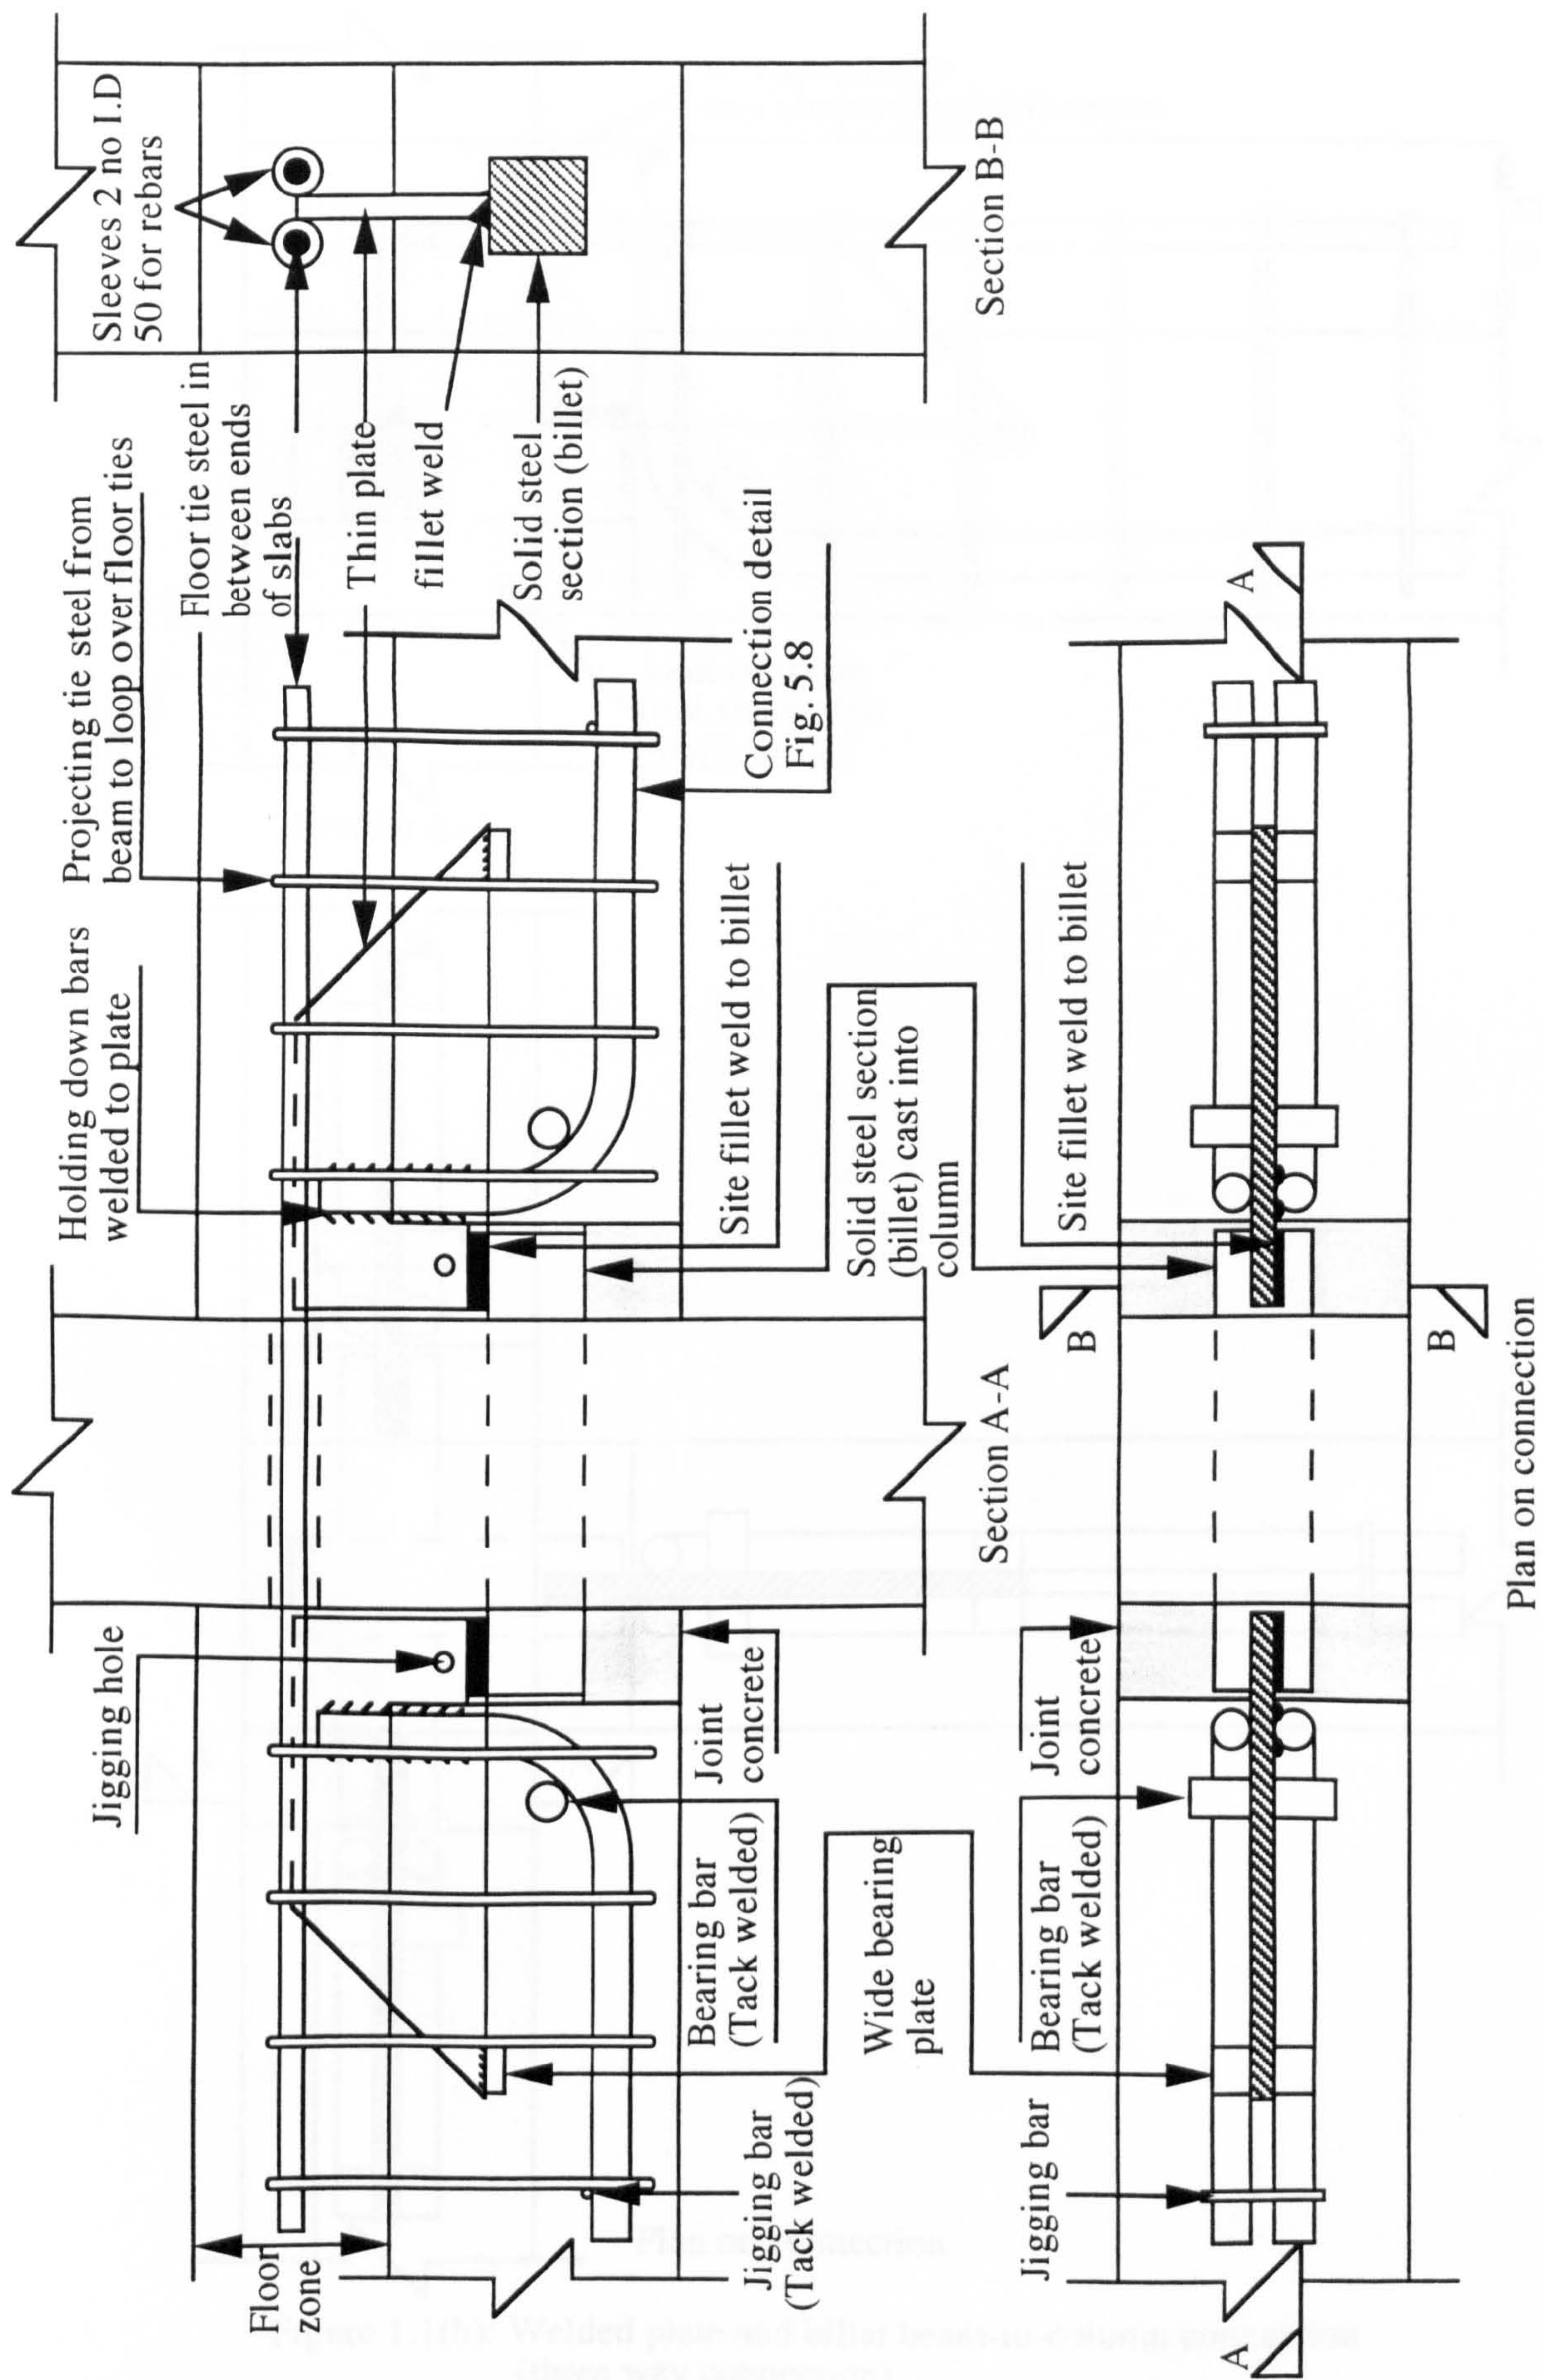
(a): Welded plate and billet beam-to-column connection (two way connection)
